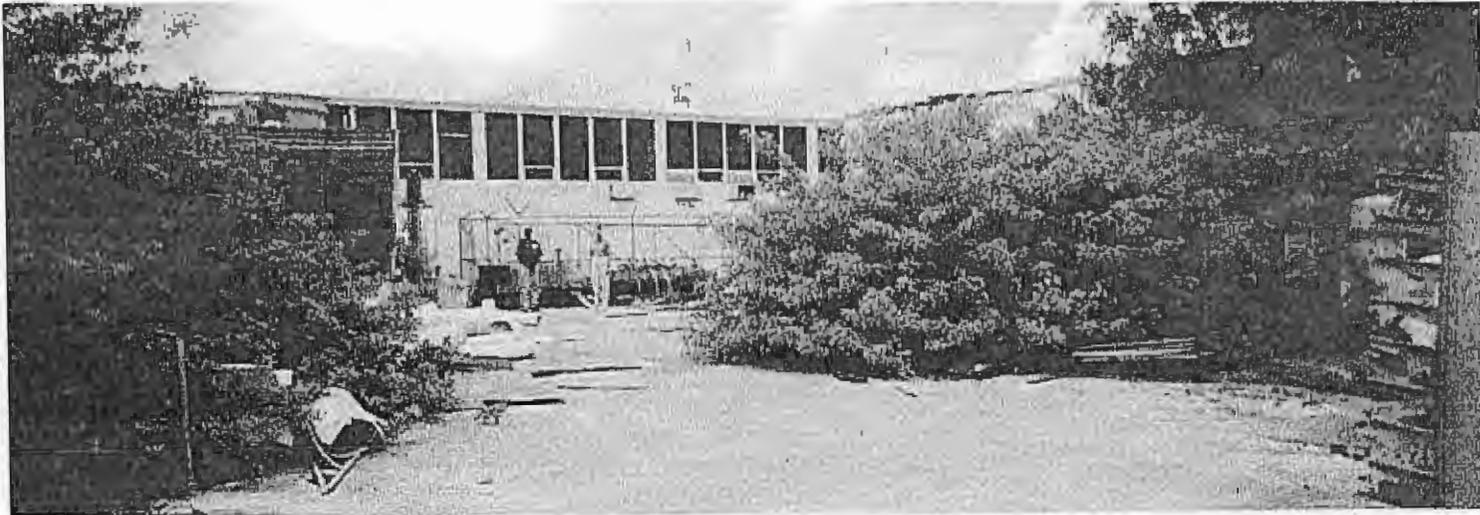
Southwest corner of the northern building. Window above Donald Sikaswe's head is broken, revealing asbestos insulation around piping. Rusty metal equipment could be a physical hazard.
